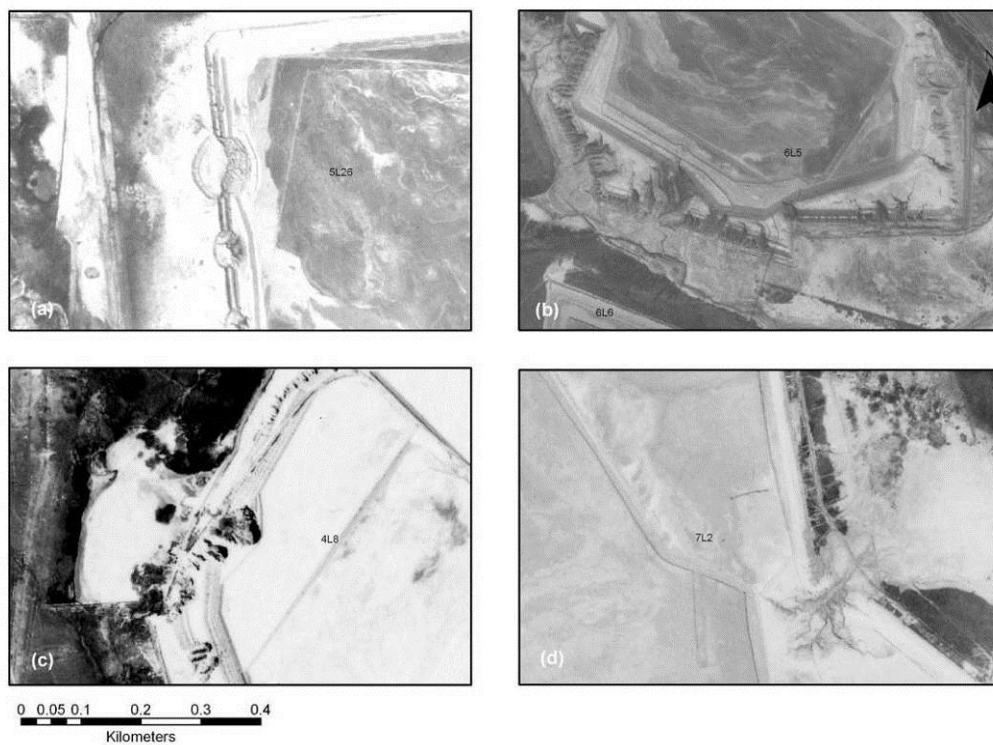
Aerial photographs showing slimes dam wall failures (a) and (b) in 1938 and (c) and (d) in 1964
